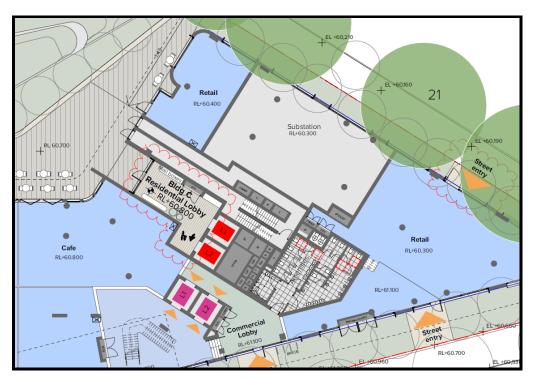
Proposed lobby - Building C (Source: Turner, March 2023)
